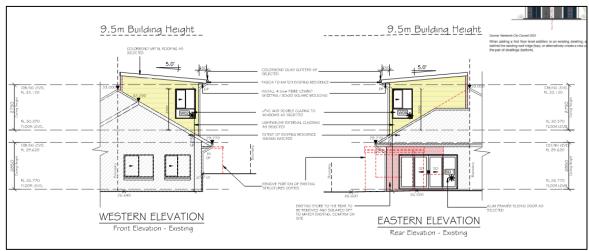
Proposed Eastern and Western Elevation Plan (Sydney Drafting Concepts & Design).
